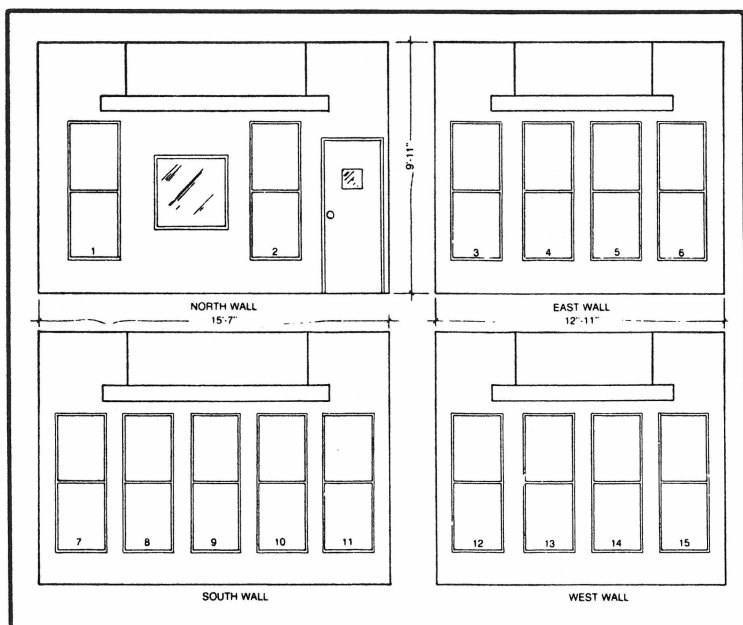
Wall elevations of production control showing original location of wide-band wall modules before adjustments were made.
